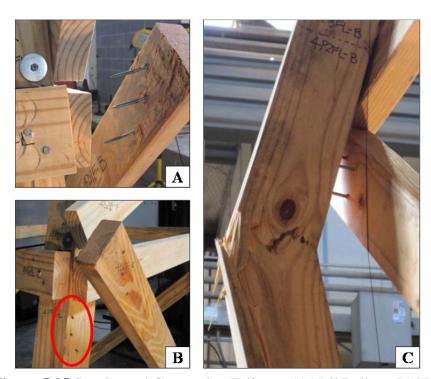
Specimen 4 Connection Failures A) Nail Pullout B) Nail Pullout Holes C) Partial Pullout on Left Side
